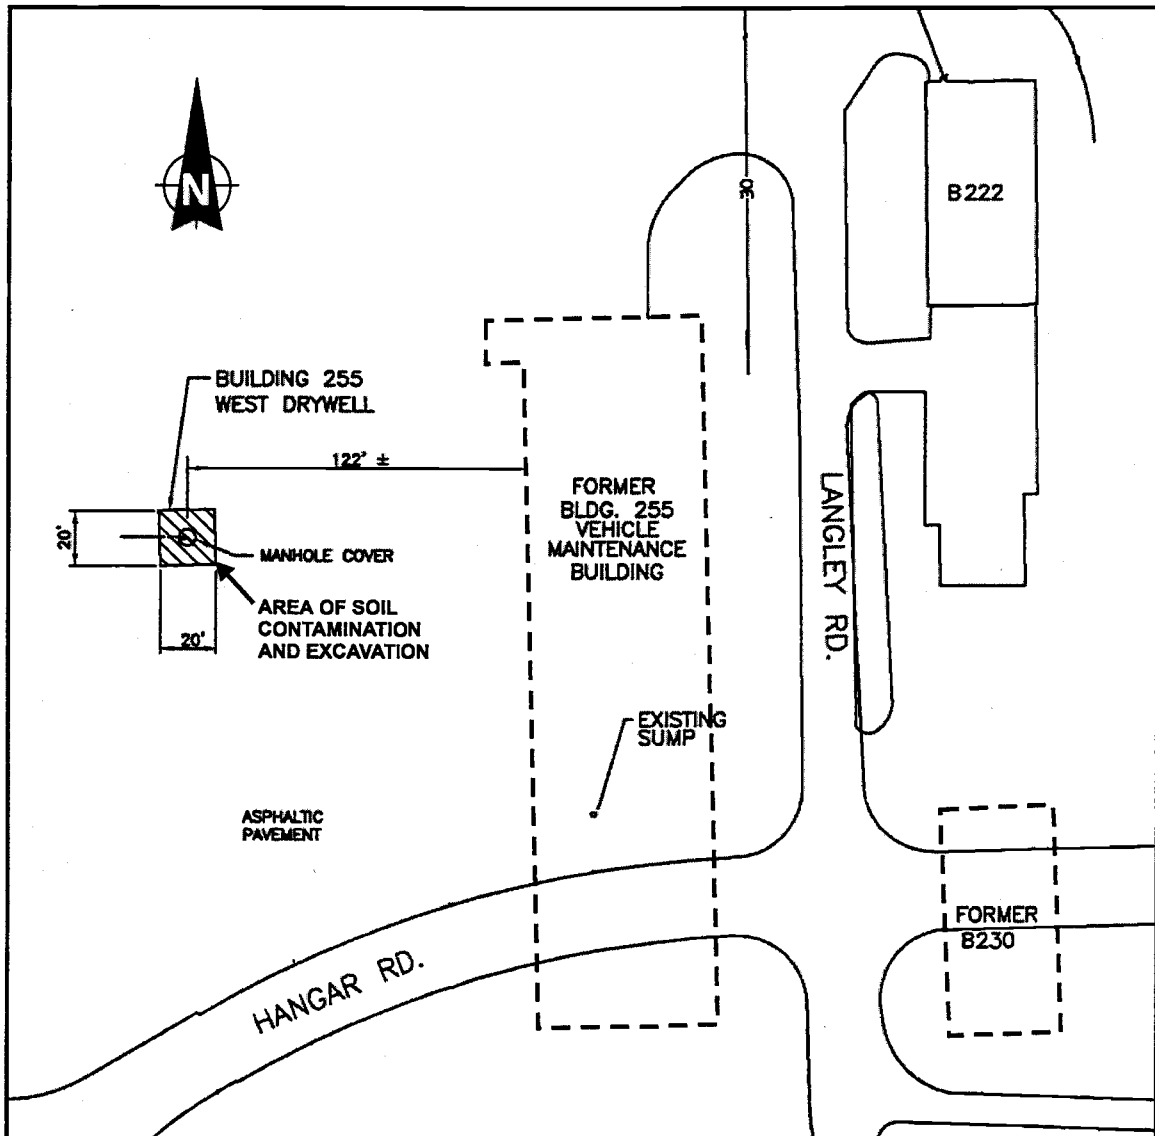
Building 255 Drywell AOC Interim Remedial Action
